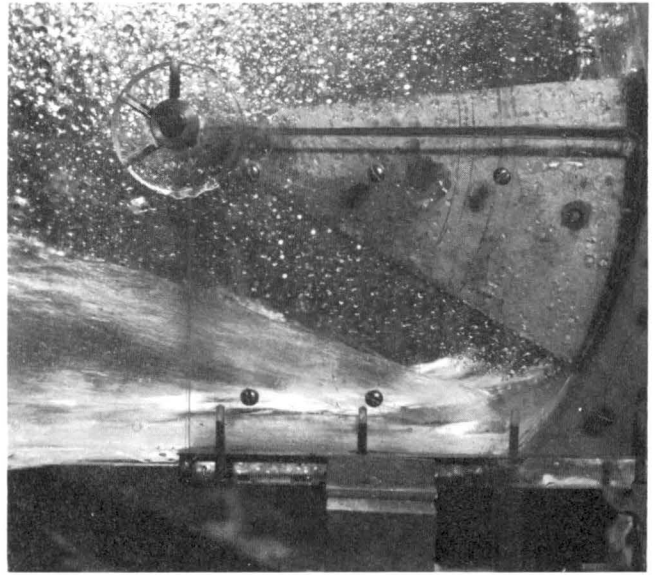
1:70-scale model with a 16-in. wall offset for 8-ft gate opening and 360-ft head.
